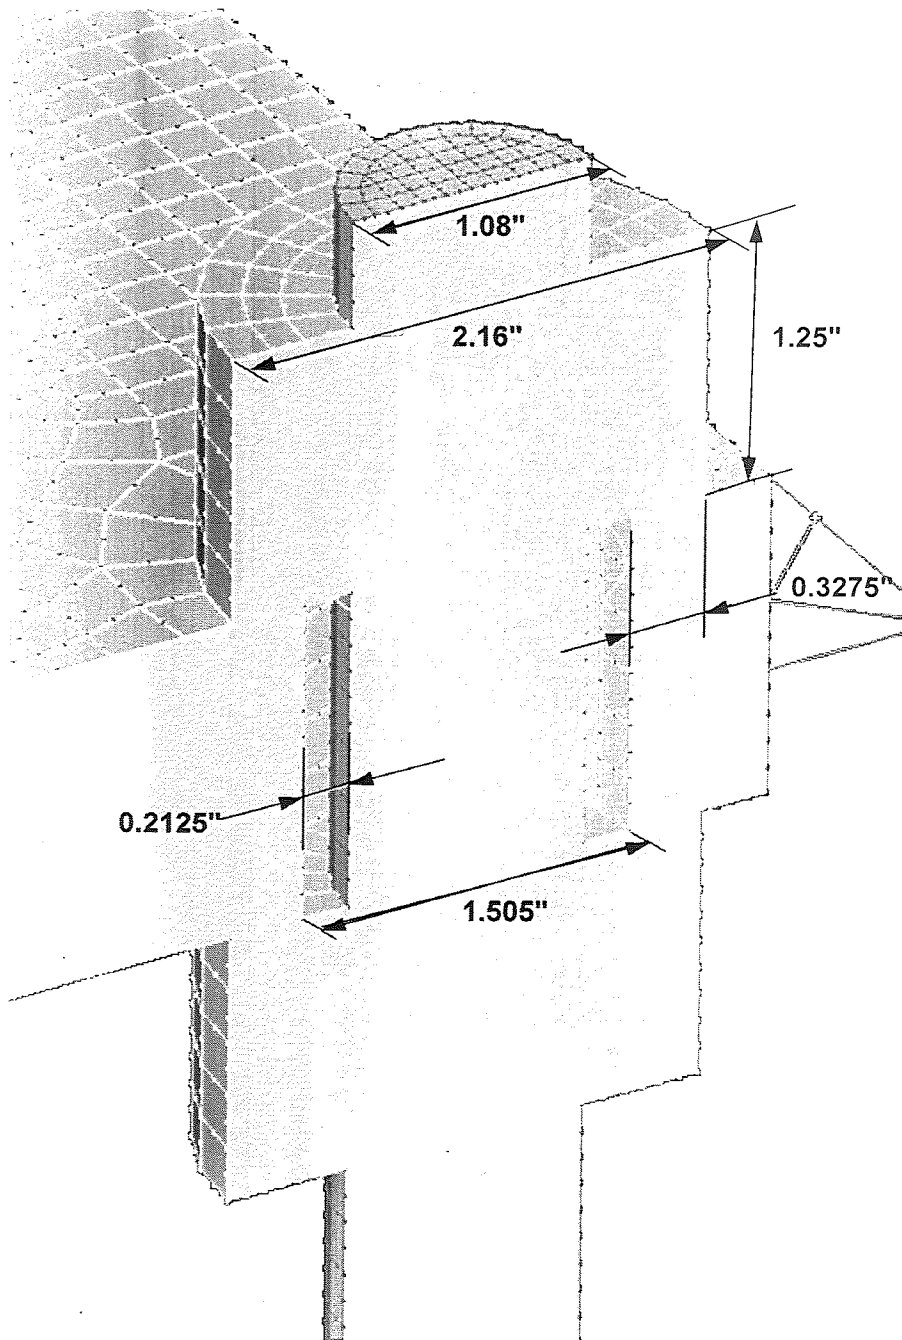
Cross Section Through Finite Element Modeled Leveling Nut to Baseplate Connection
